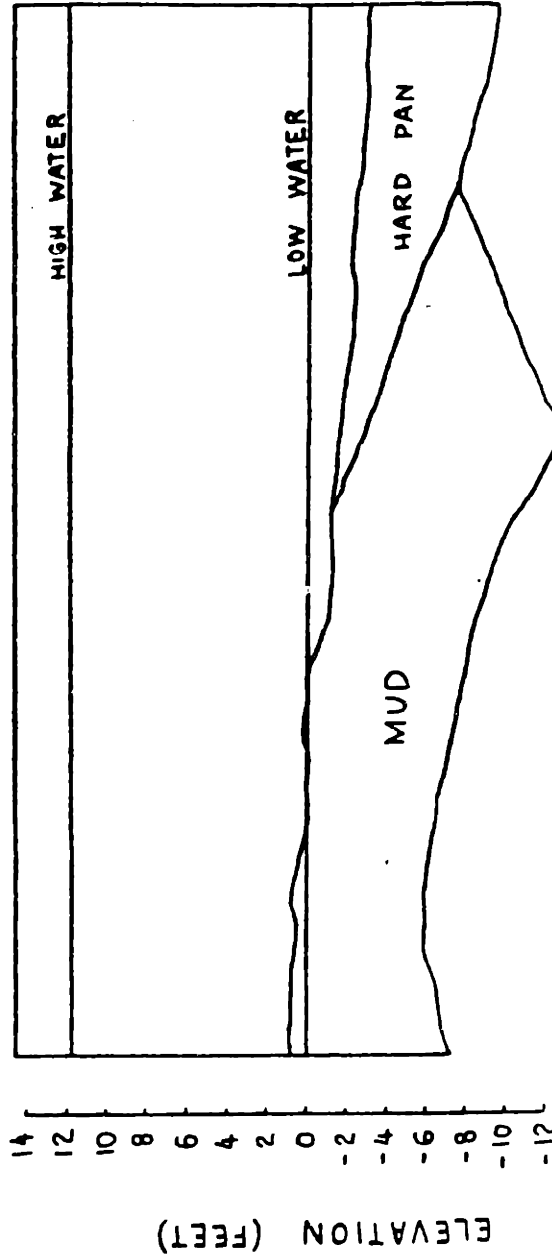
Prefill Cross-section of South Boston Flats (Parrott, George B., 1849)
